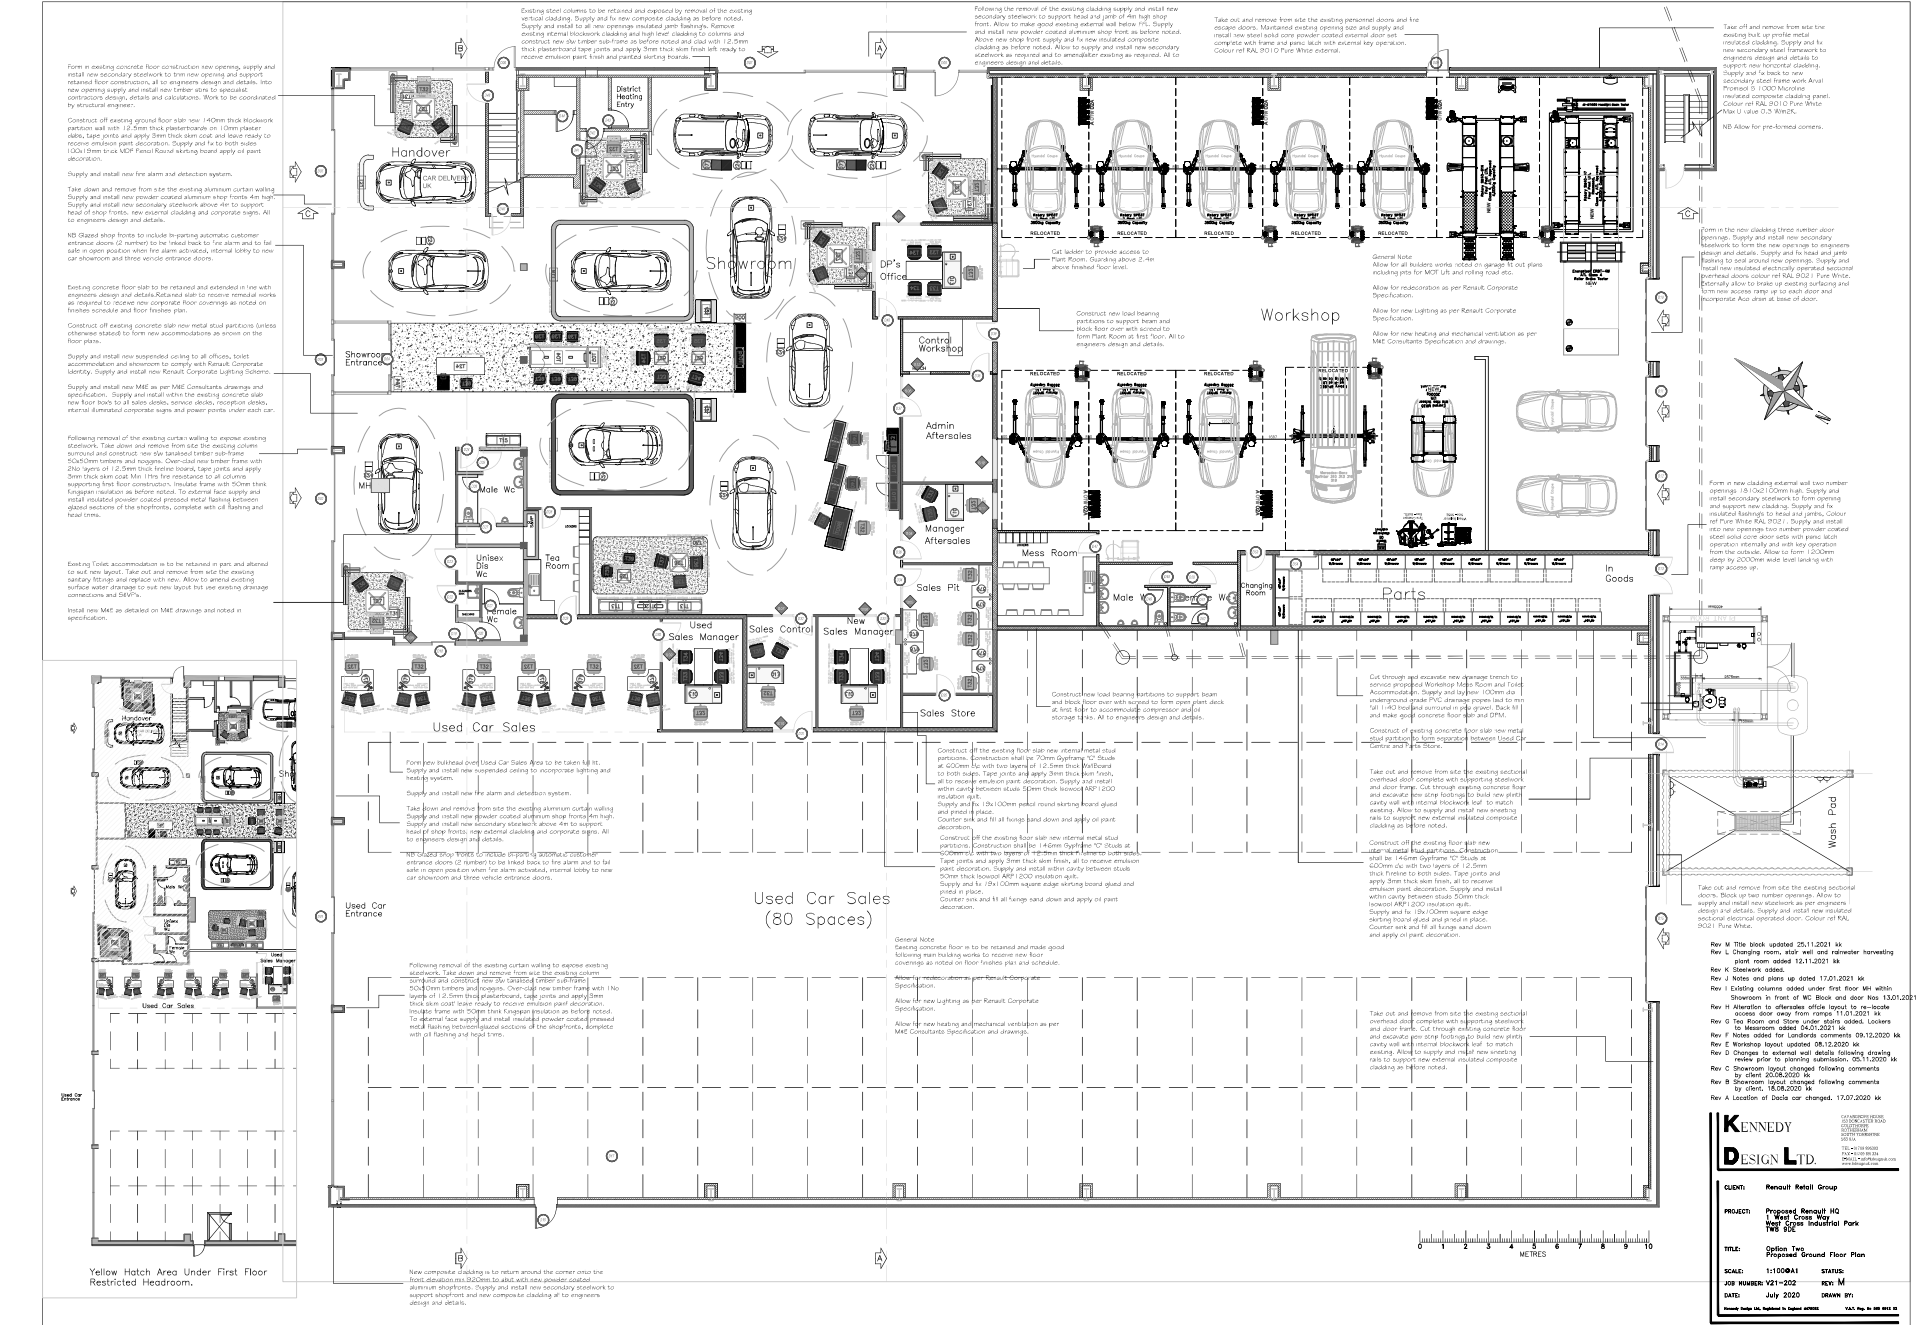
From left, Renault Proposed First Floor and Ground Floor plans
